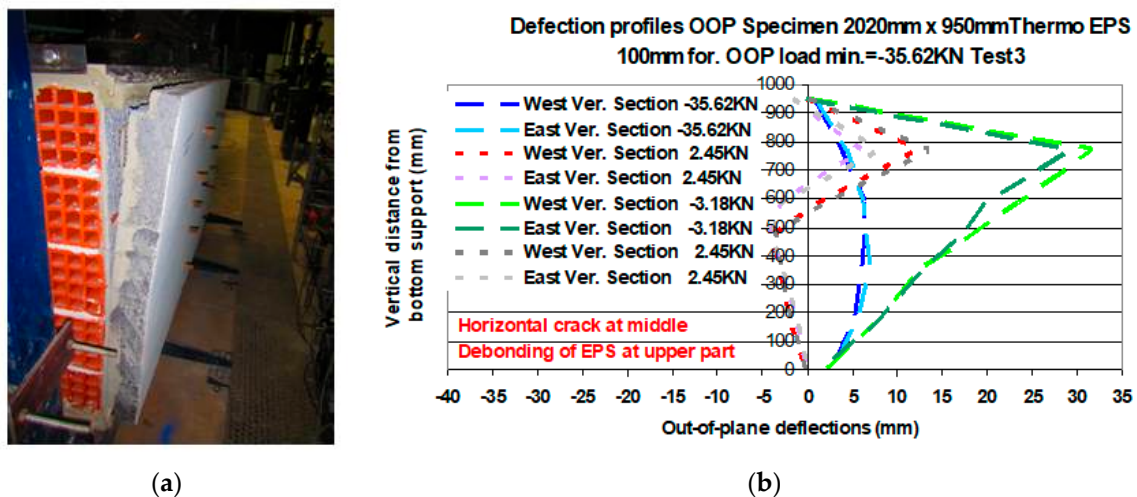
(a-left) Masonry wallet with expanded polyester attachment—horizontal cracking at mid height and extensive debonding of EPS at the upper part. (b-right) East and West vertical cross-section out-of-plane horizontal displacement profiles for certain distinct stages of the out-of-plane horizontal load applied to the masonry wallet with expanded polyester thermo-insulating attachment.
